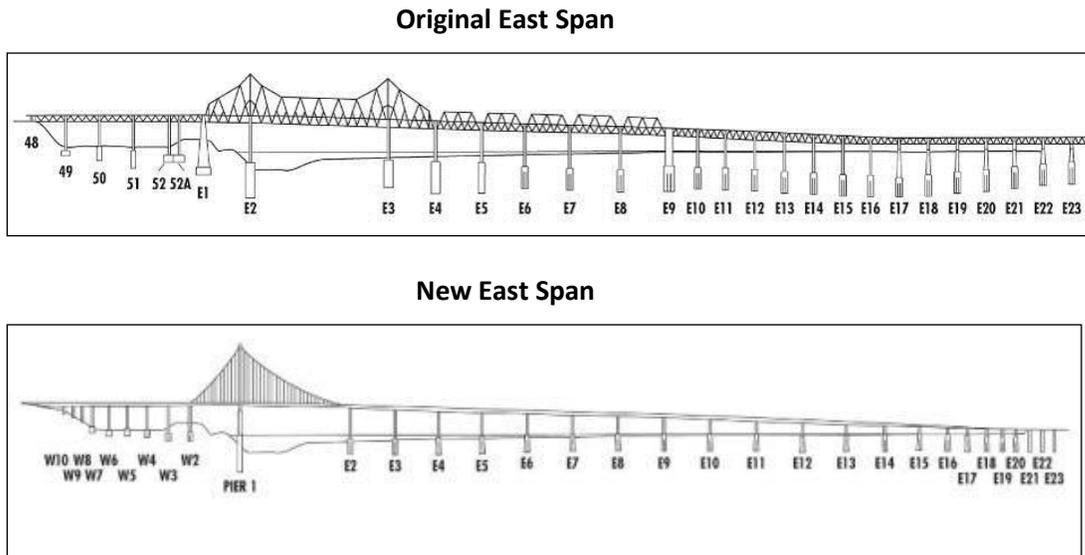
San Francisco–Oakland Bay Bridge Pier Locations
